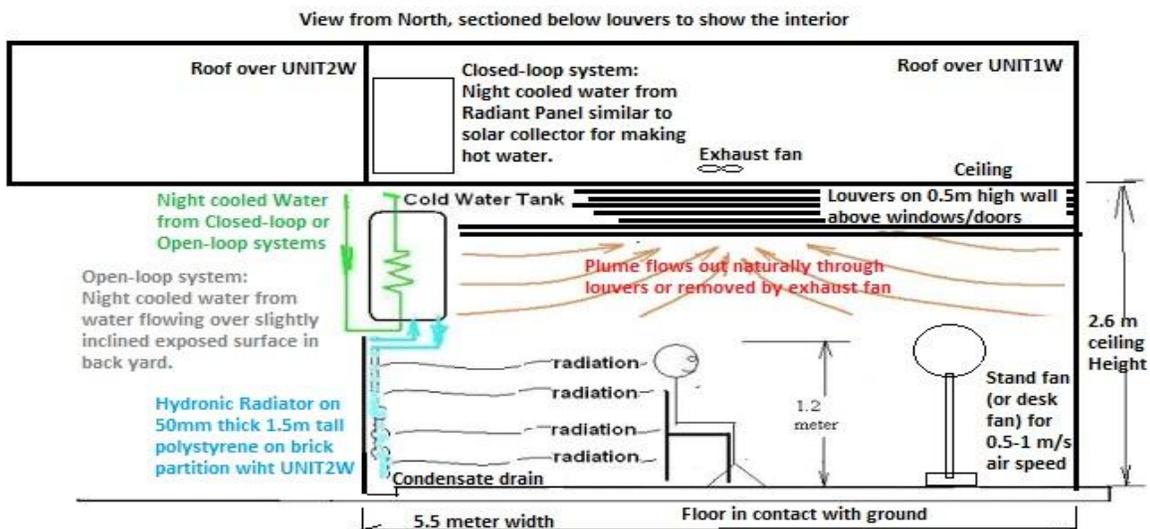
North View, sectioned below the louvers on the north wall to show the interiors.
